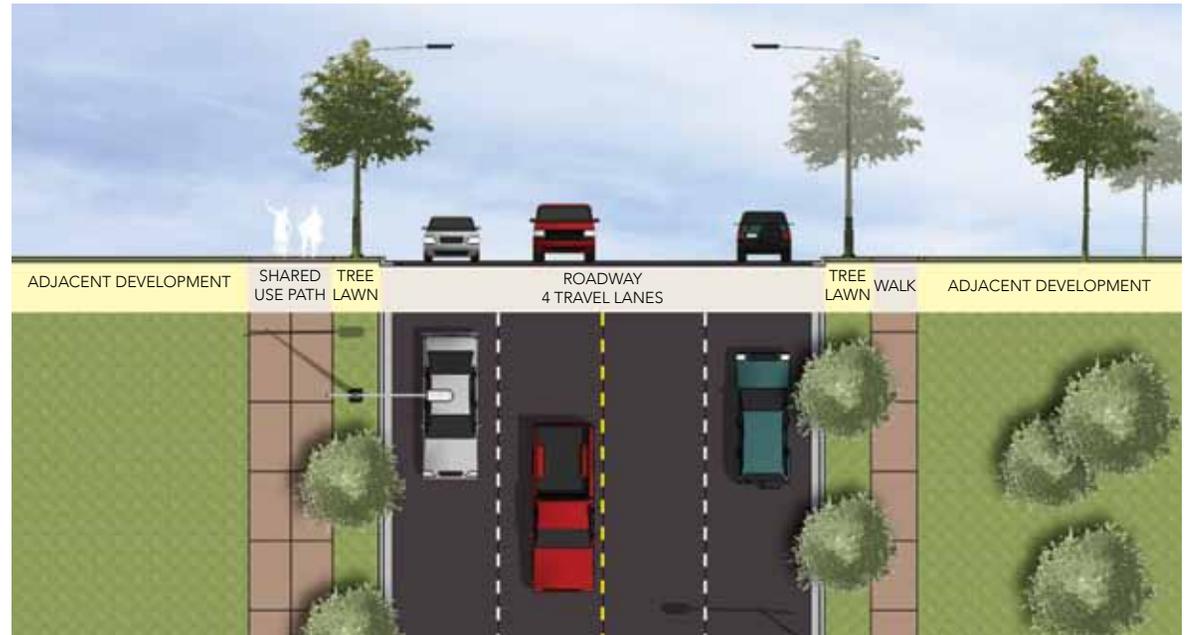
Division Road- Cross section and plan view of proposed roadway character.
